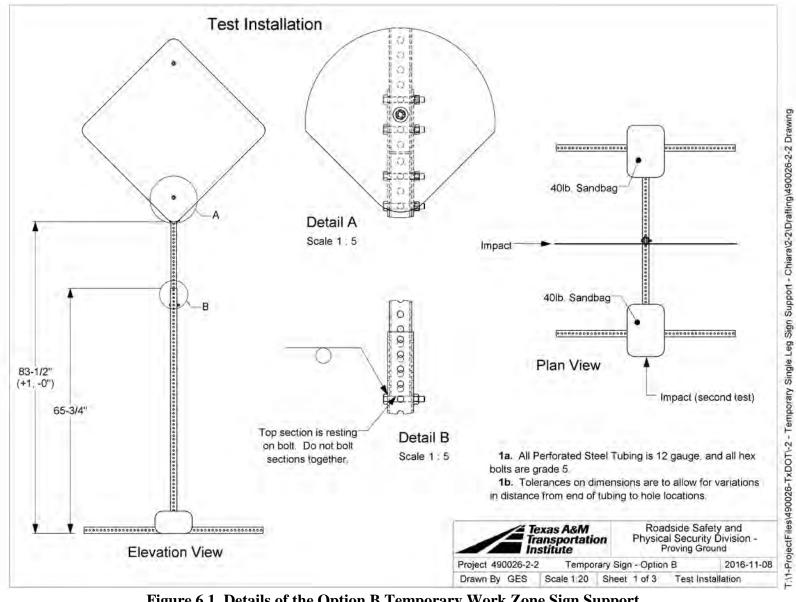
Details of the Option B Temporary Work Zone Sign Support.
